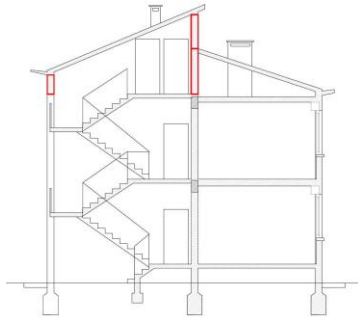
Cross-section highlighting in red the most vulnerable masonry walls arranged in the longitudinal direction of the building. From [248].
